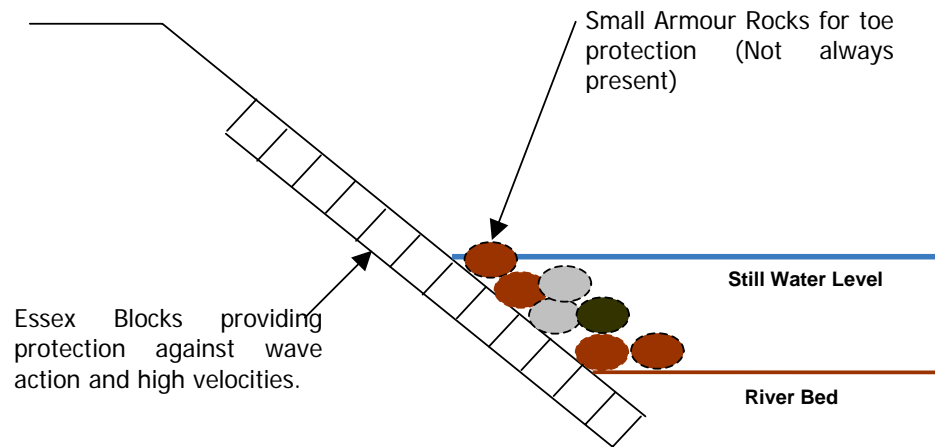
TYPICAL CROSS SECTION OF ESSEX BLOCK REVETMENT WITH ROCK ARMOUR TOE PROTECTION
